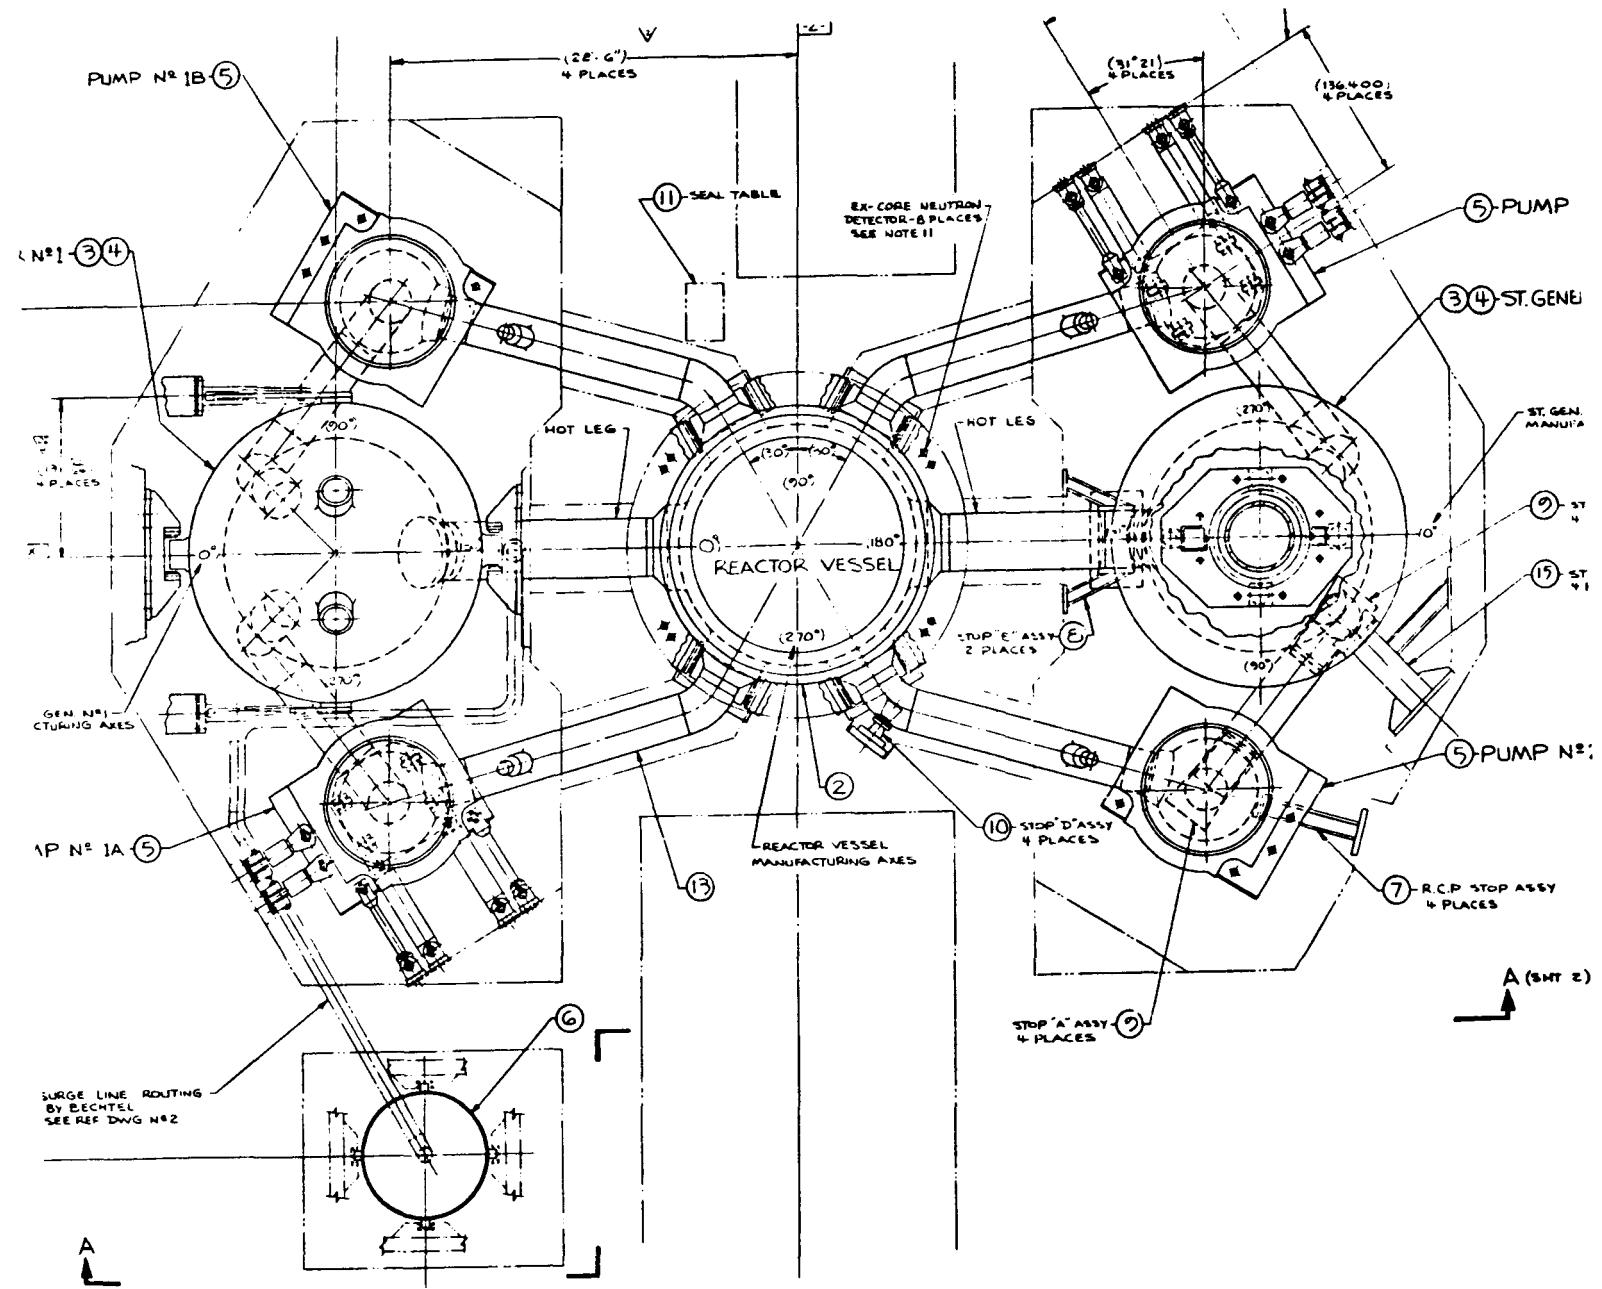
PALO VERDE REACTOR COOLANT LOOP ARRANGEMENT - PLAN
